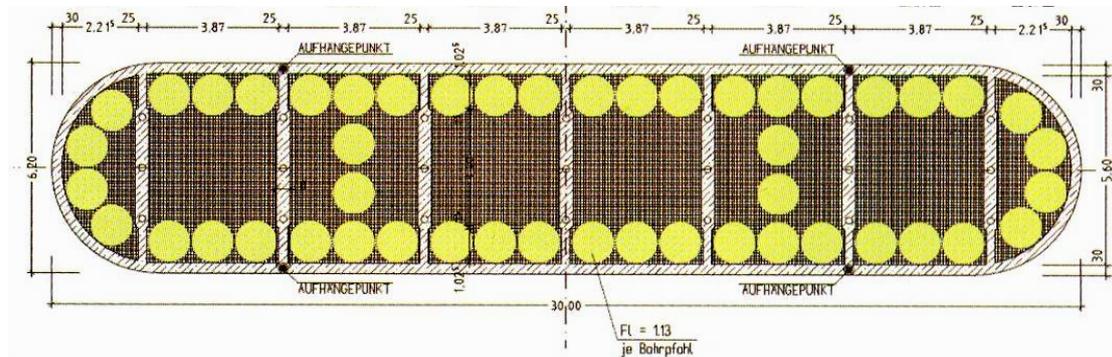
Ground plan of the box-shaped pile foundation of the main bridge piers in the river-bed of Danube River Bridge Traismauer [7]
